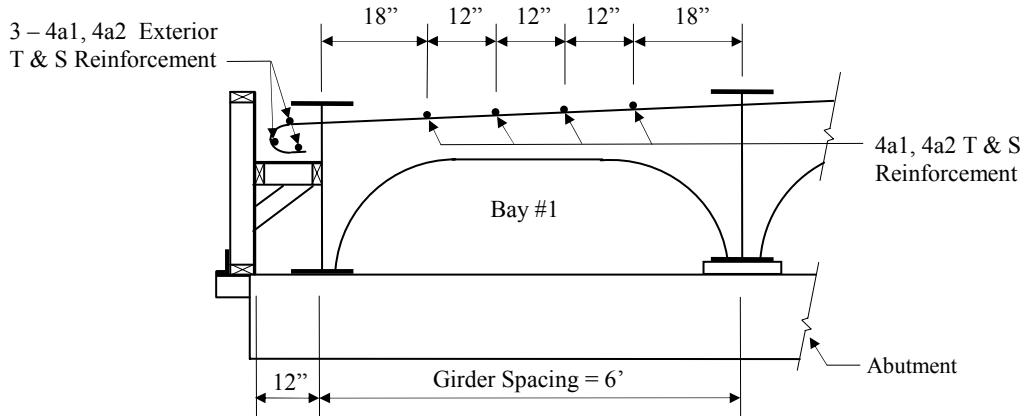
Typical layout of the longitudinal T & S reinforcement.
